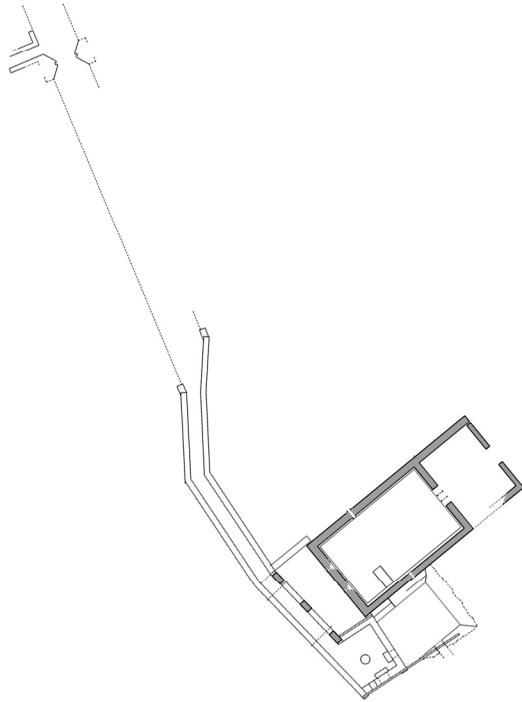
Site plan showing ground floor plan with channel up to first sluice on a scale of 1:500
